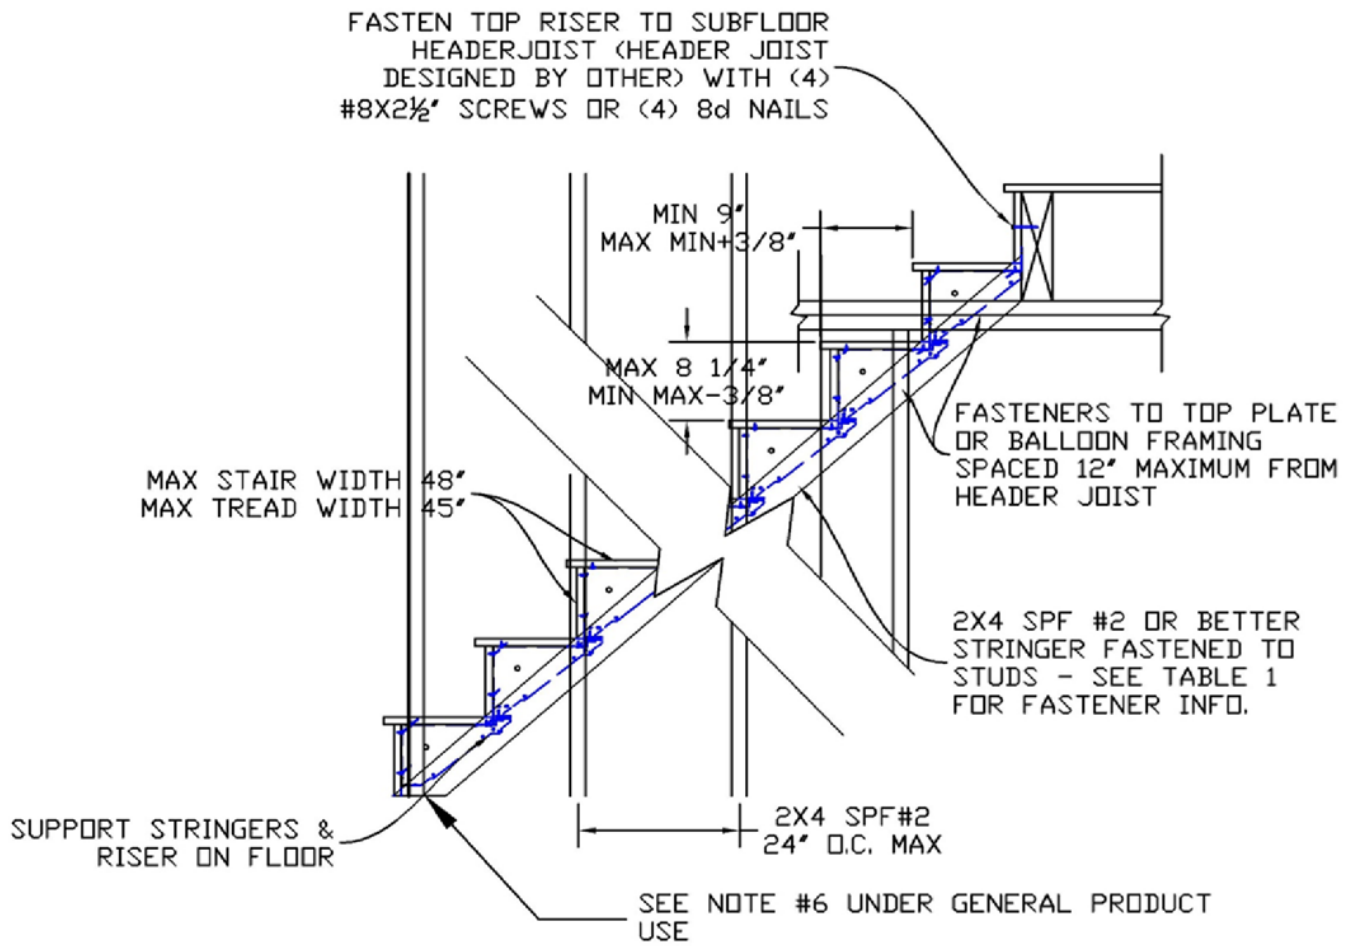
IStair™ SYSTEM BRACKET AND HINGE-GUSSET INSTALLATION DETAILS
